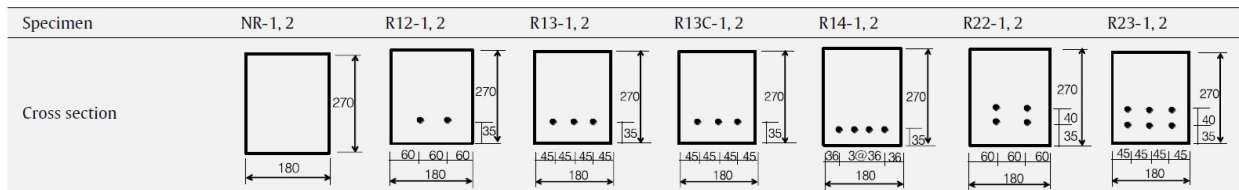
Cross-sectional dimensions and reinforcement configuration for beams tested by Yang et al. (2010).
